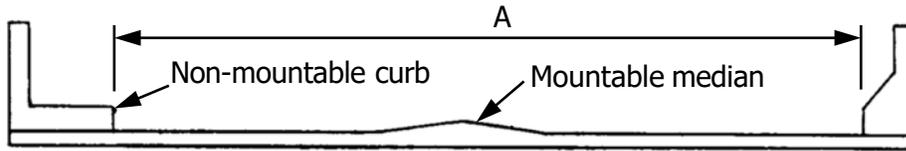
Cross-section view of a highway feature carried on the bridge with a mountable median.
